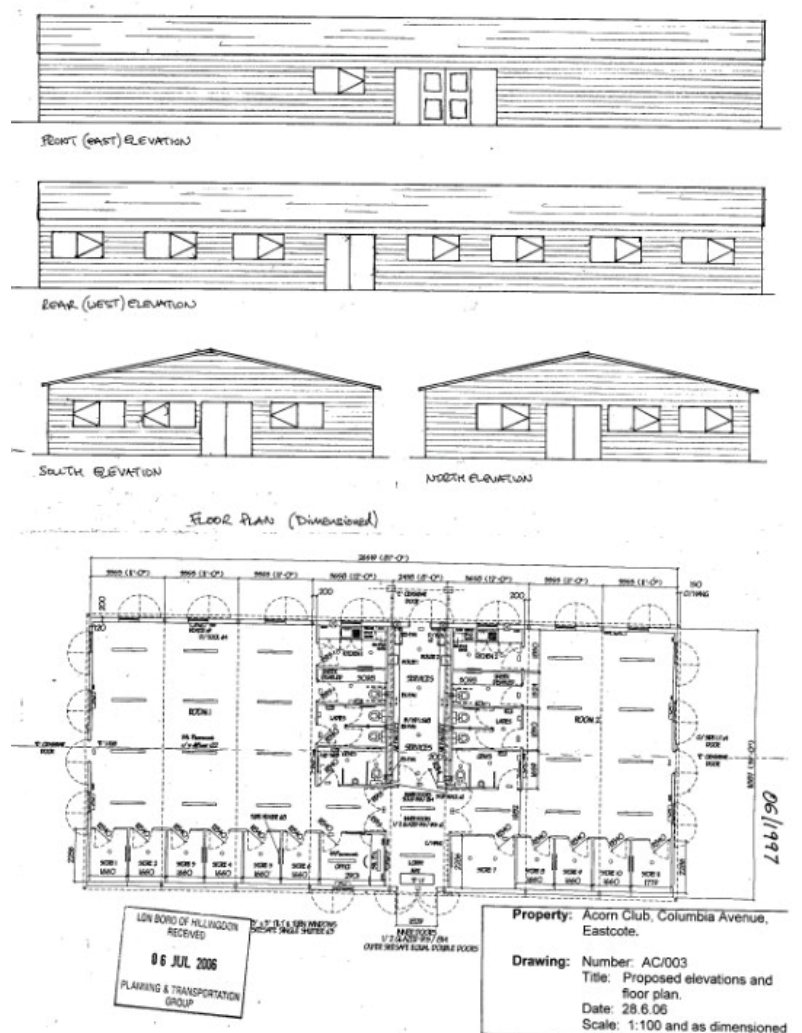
Proposed Side Elevations (please note – larger version of plan can be found in the Committee Plan Pack).
